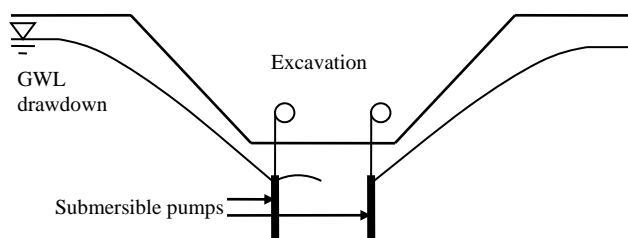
Dewatering in Excavation to Lower Ground Water Table
